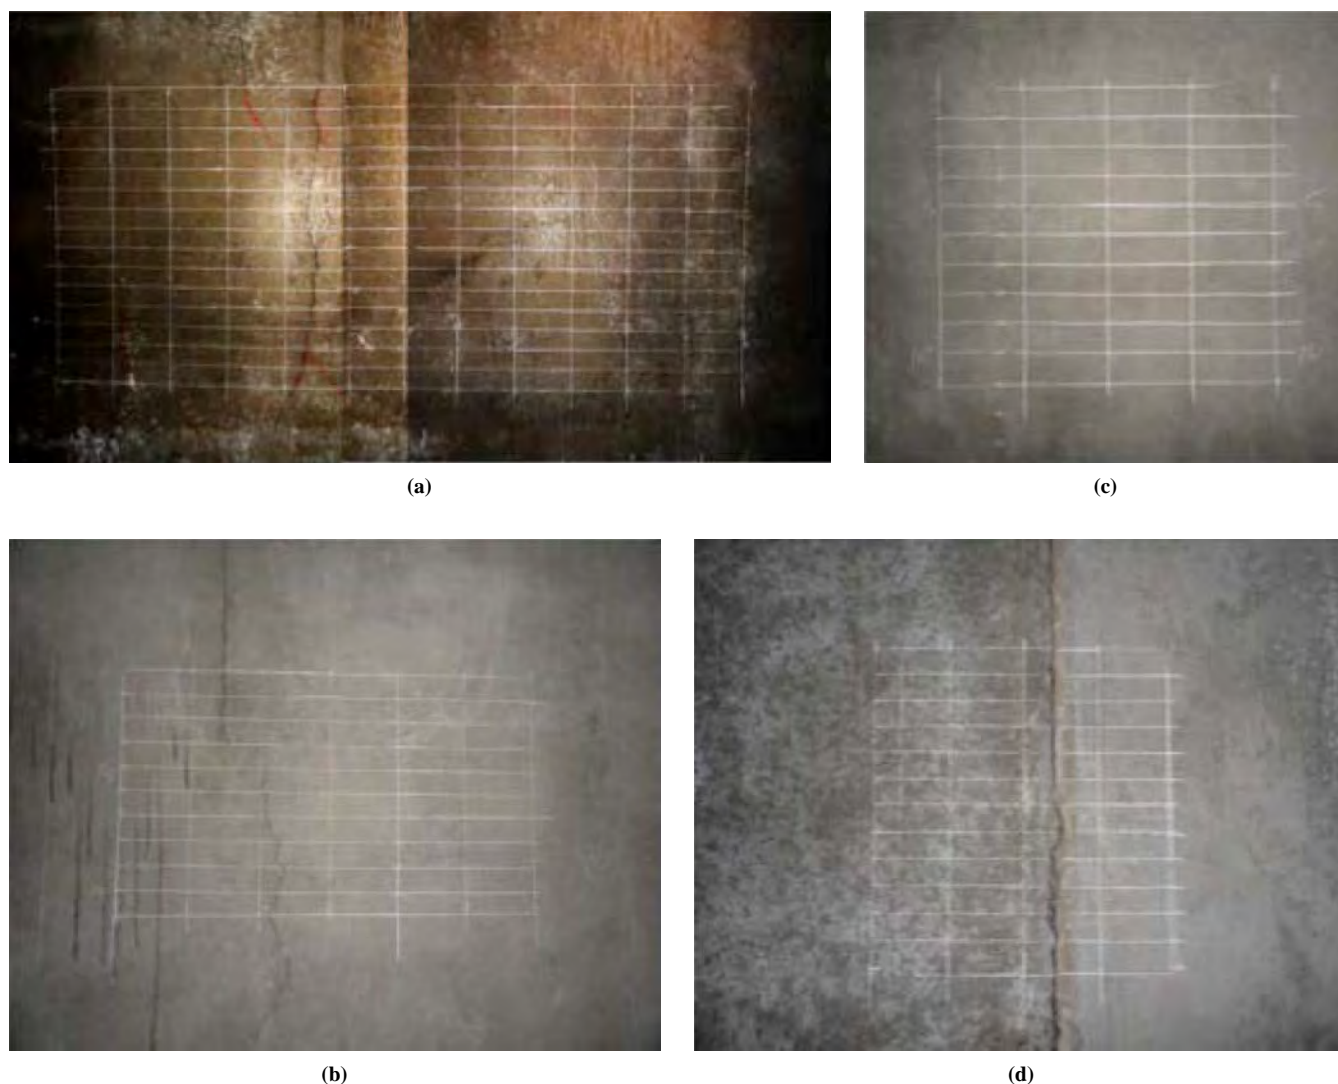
Images of areas tested at Hanging Lake Tunnel: (a, b) severe vertical cracks, (c) sound concrete, and (d) lining joint.
